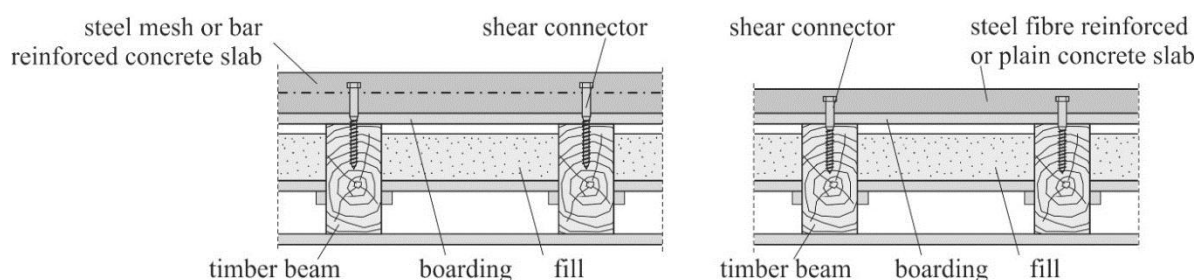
Strengthening of existing timber beam ceilings with TCC [18], [21]
